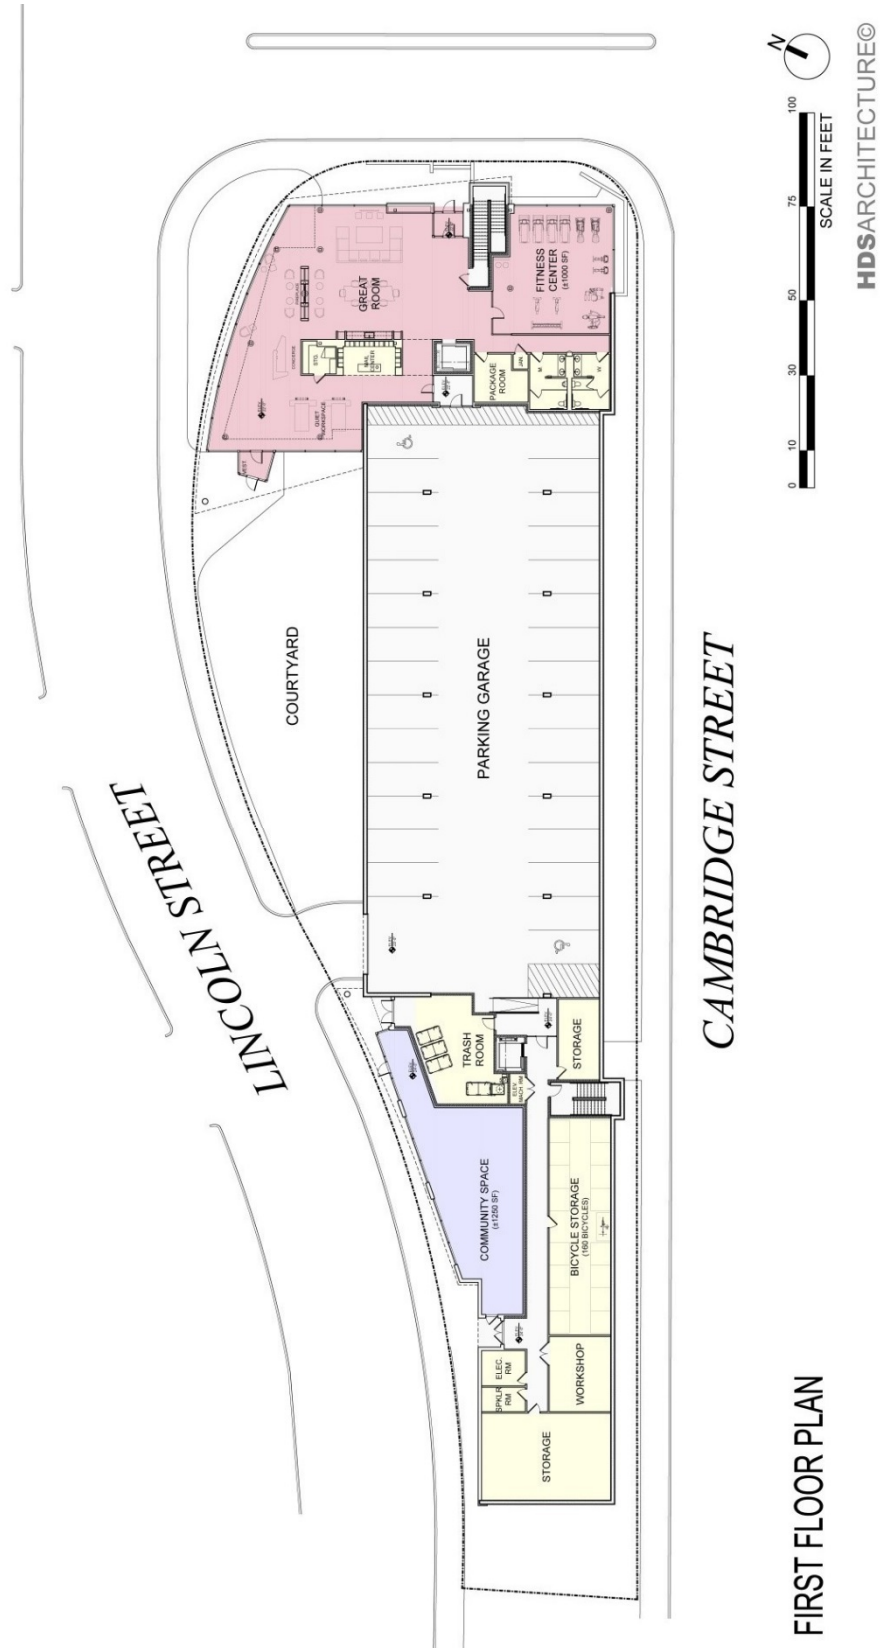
Preferred Alternative (Ground Floor Plan)
